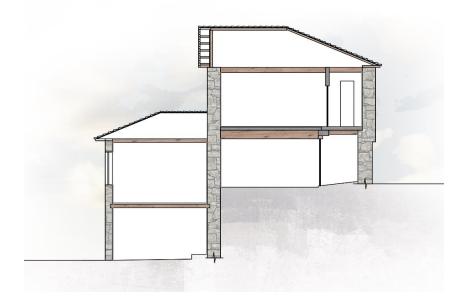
Beqiri, A. (2024) Lluke Zanati House Section
